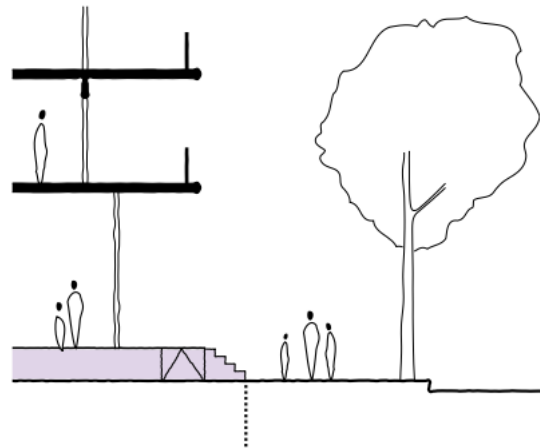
External transition section showing a step and ramp located outside of the building. This area can be designed to include other architectural elements.
